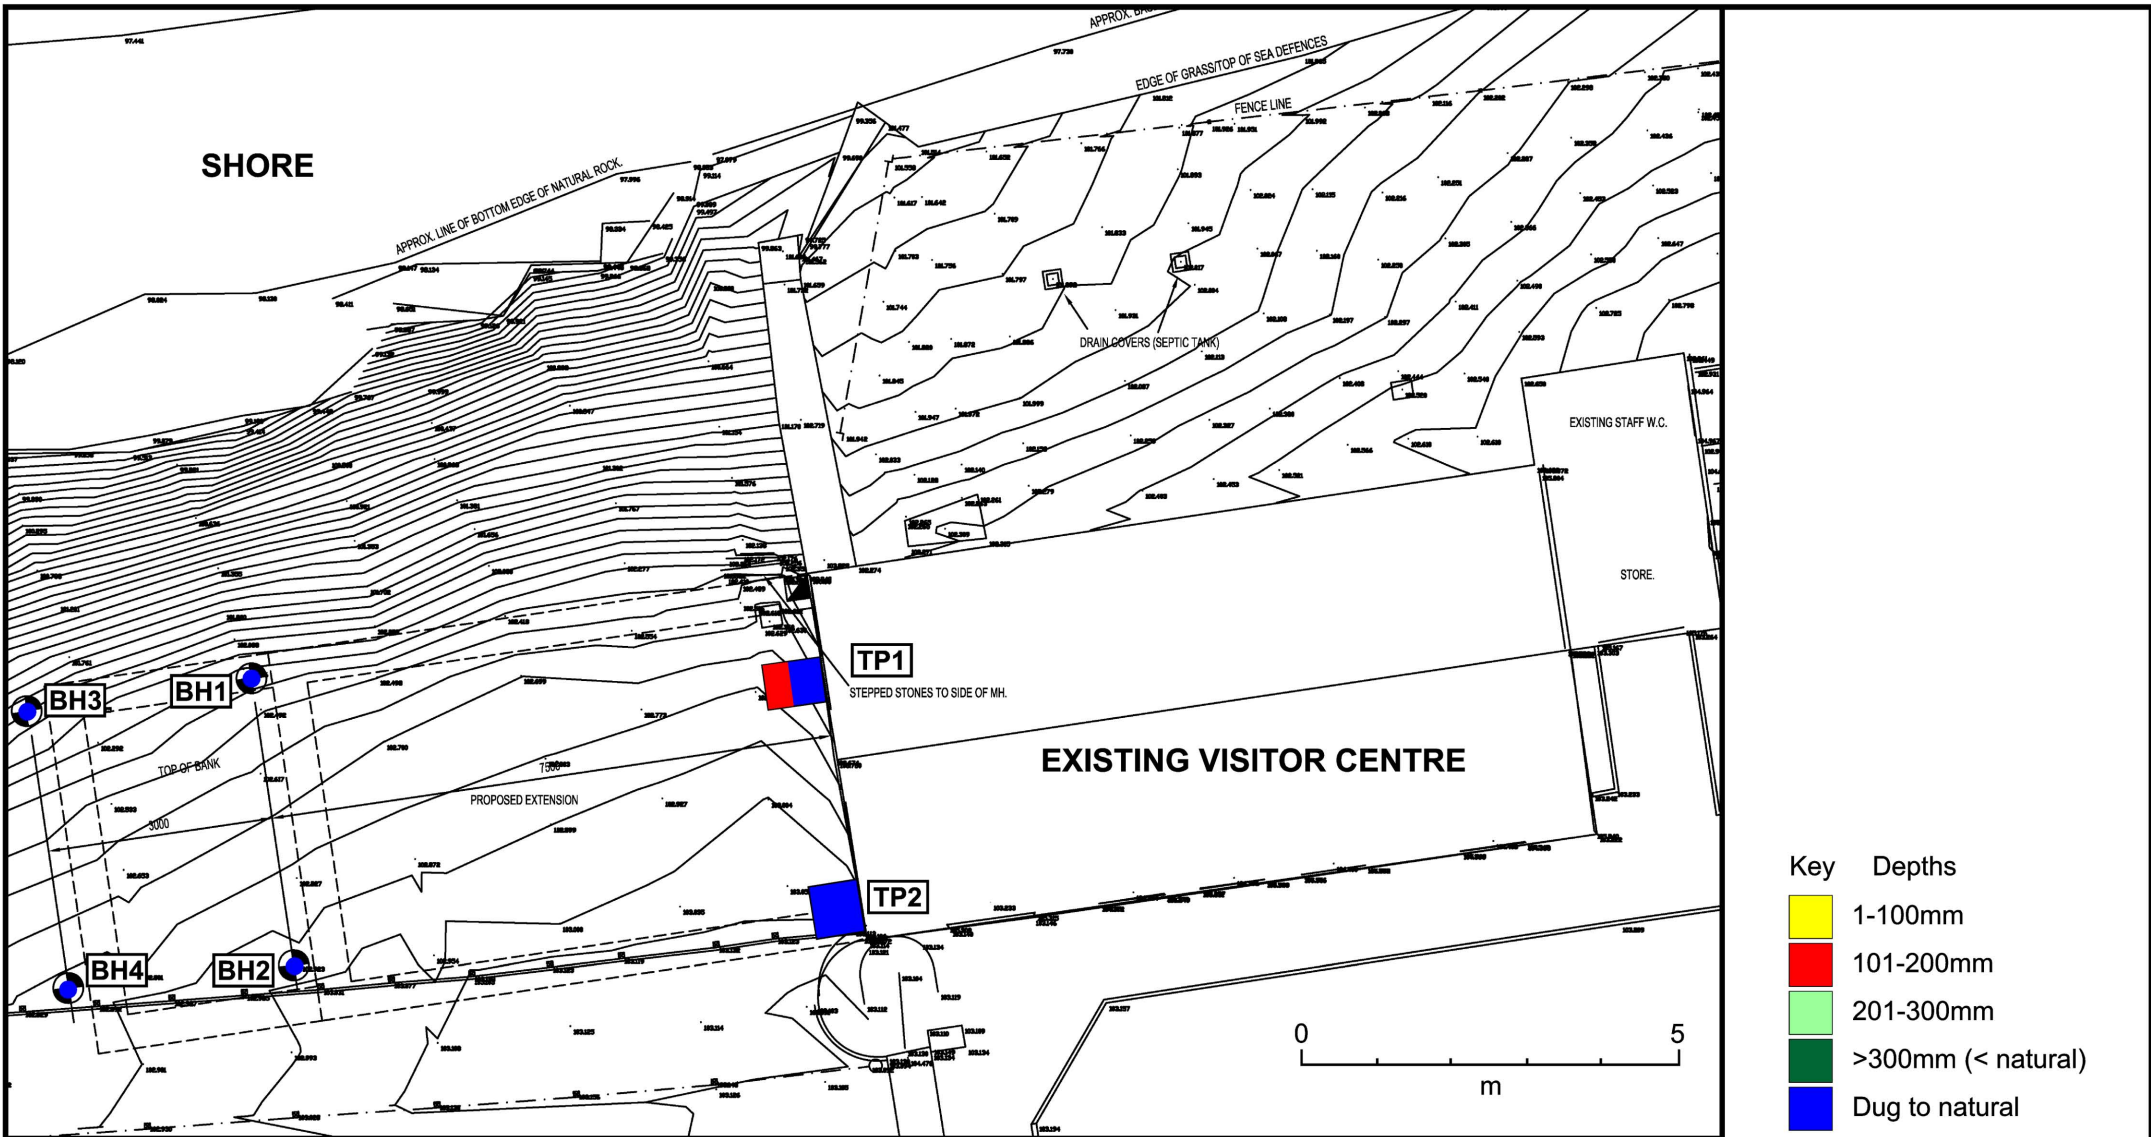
Plan (1:100) showing location of test pits and boreholes
